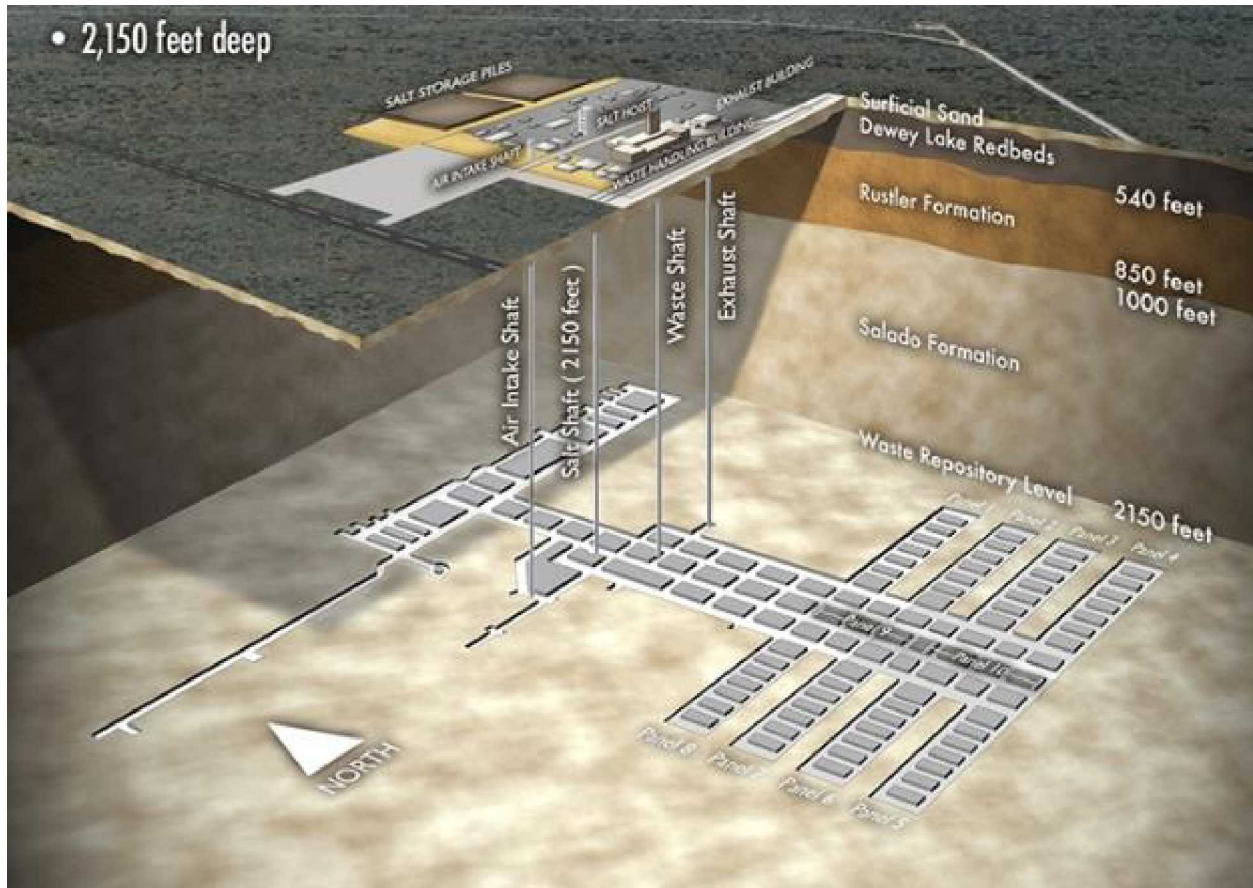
Design layout of the WIPP GR showing key surface facilities, waste repository level underground, and vertical shafts between the two. Source: [15].
